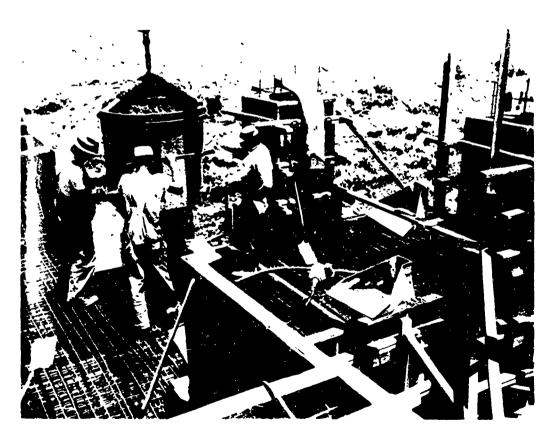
Structure II-3, concrete placement in walls and roof slab (June 7, 1957).
